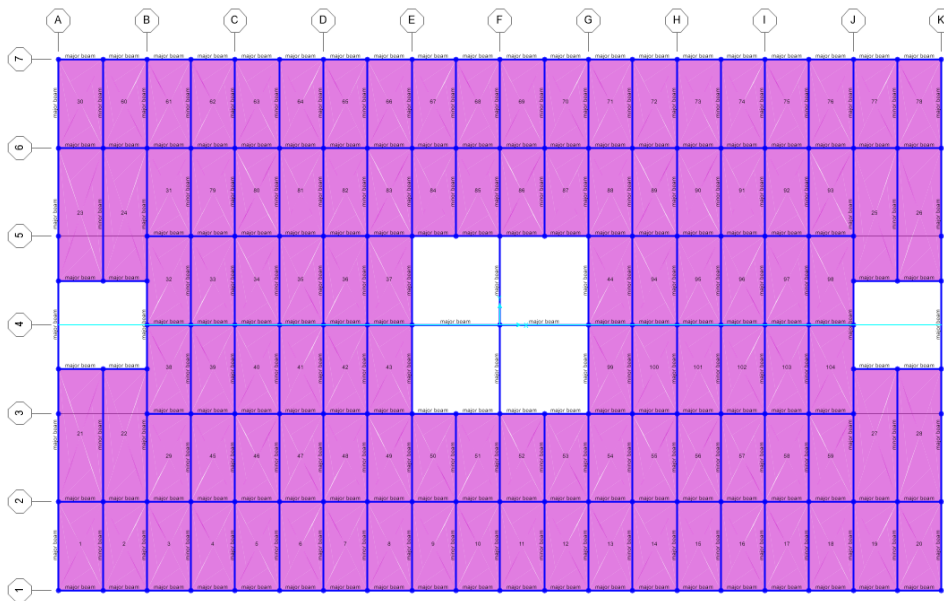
Structural layout assigned to the SAP 2000 model.
